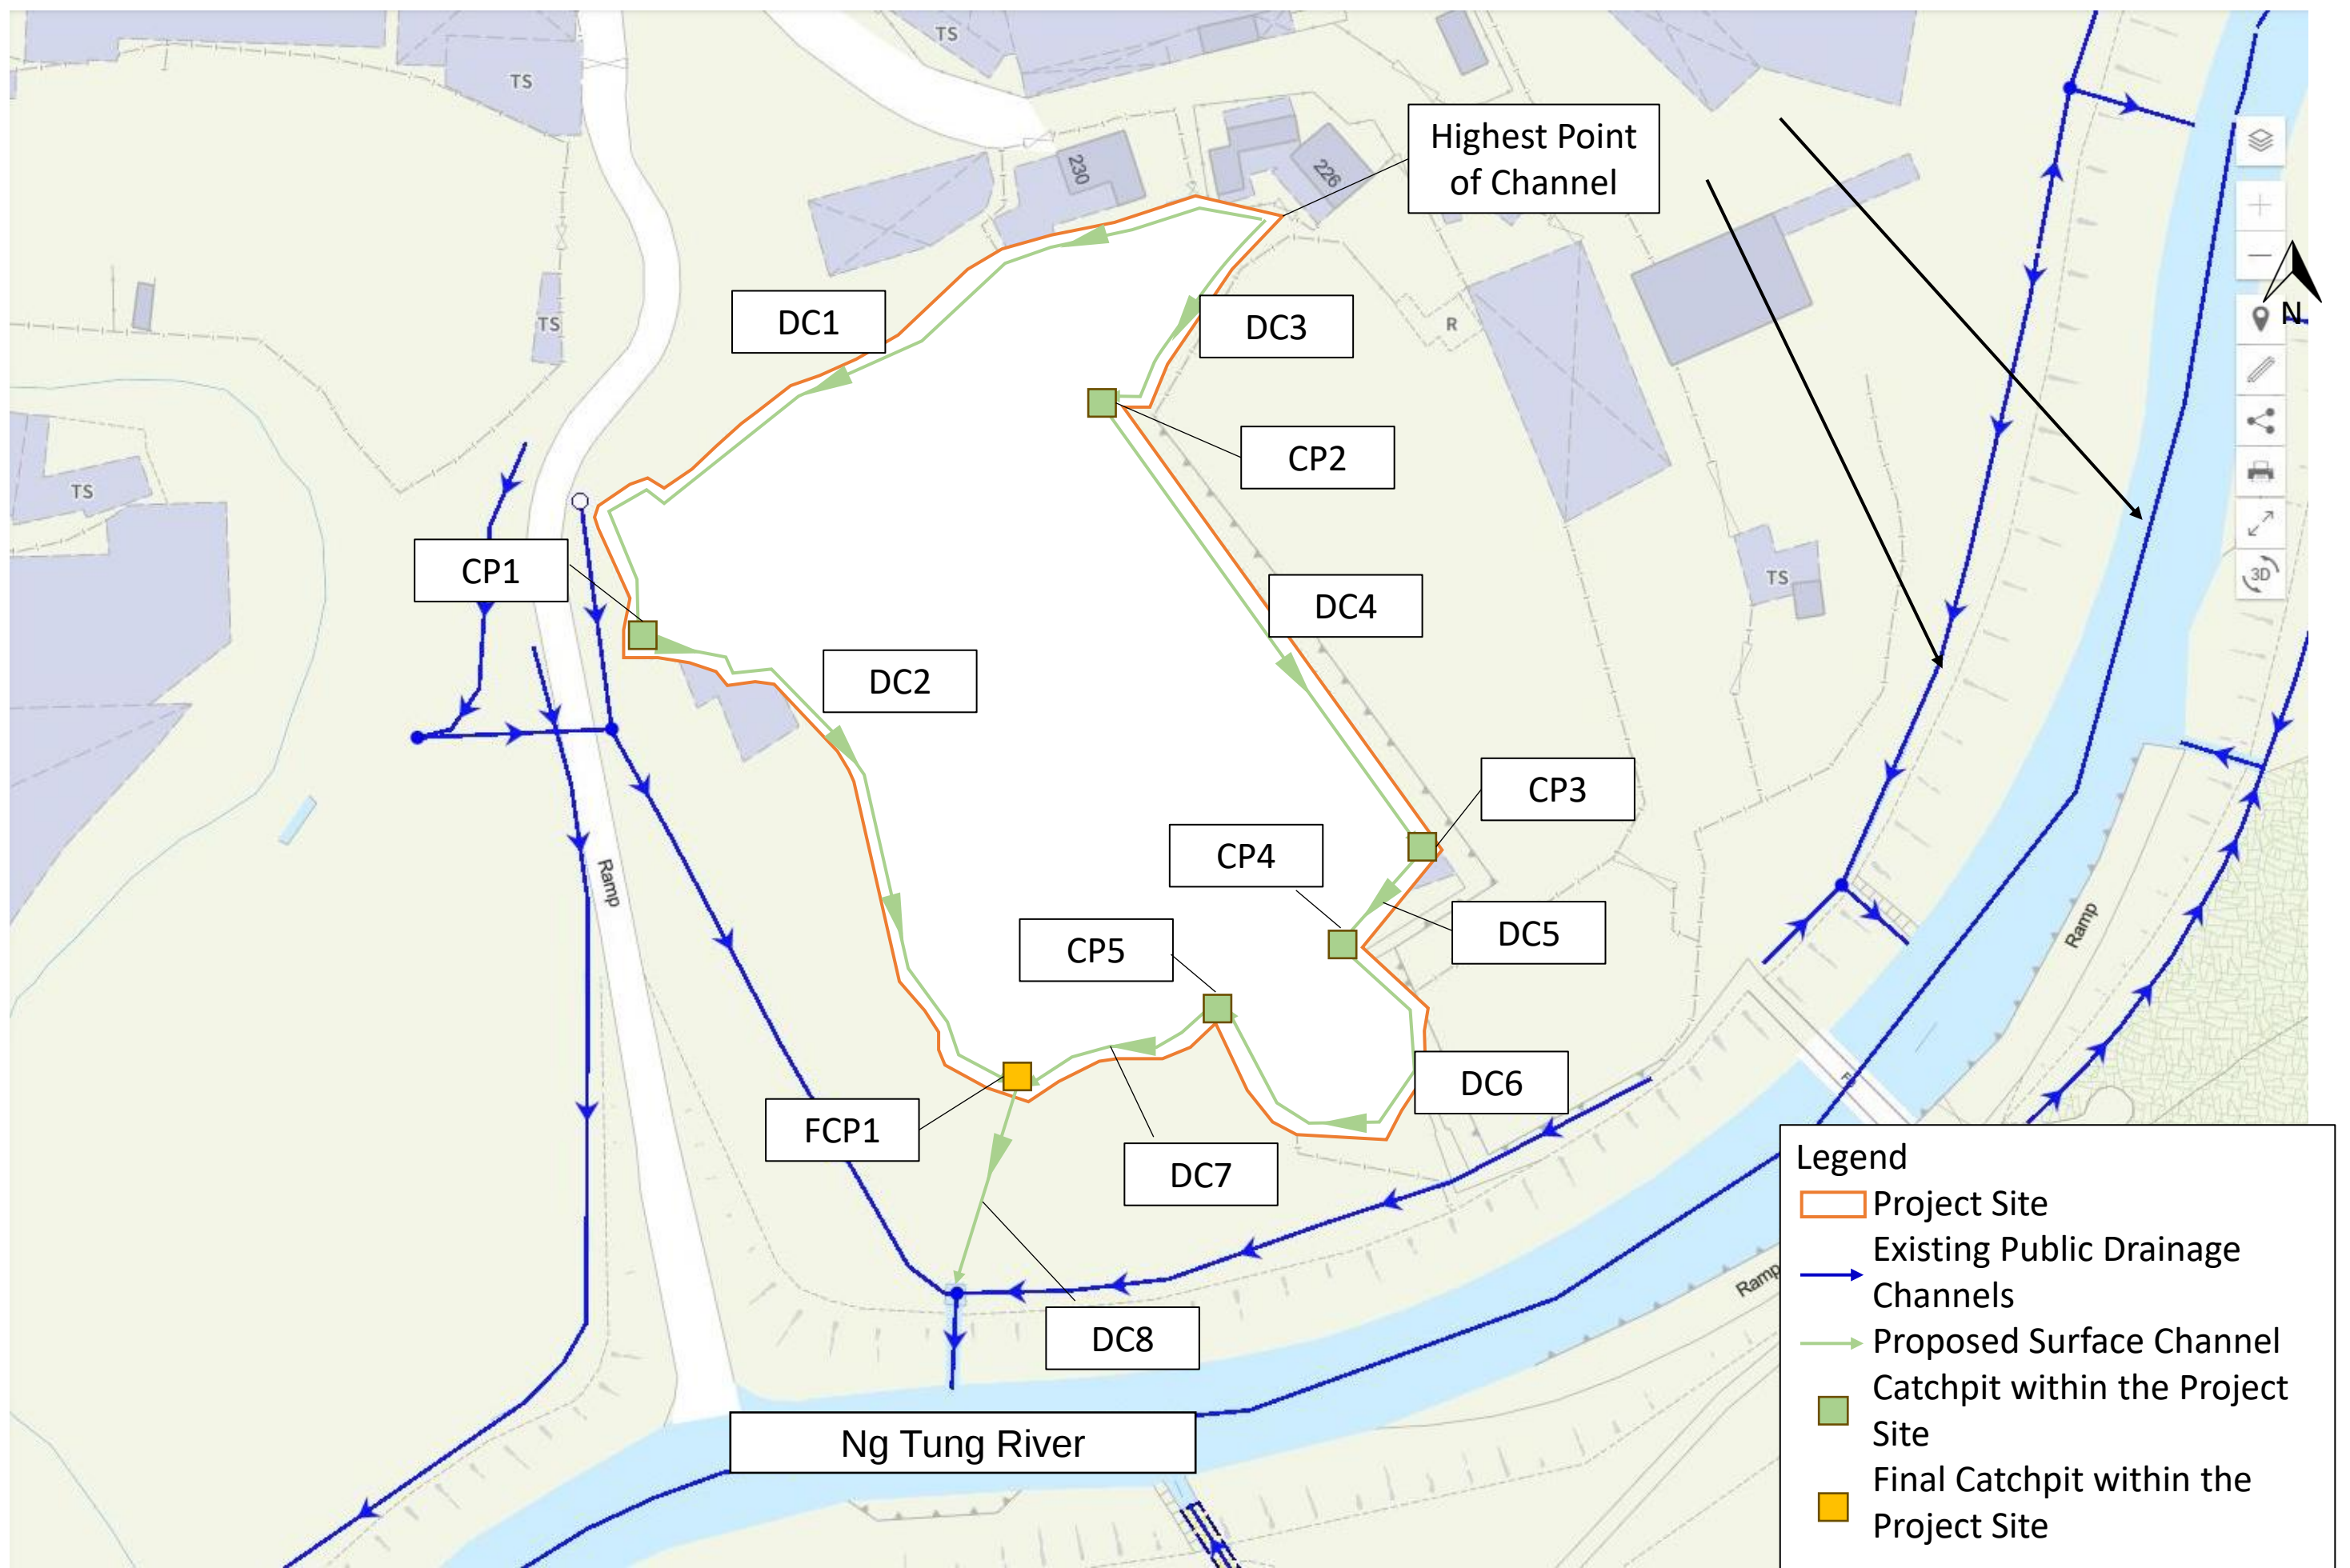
Proposed Layout of the Drainage Channel for the Project Site
